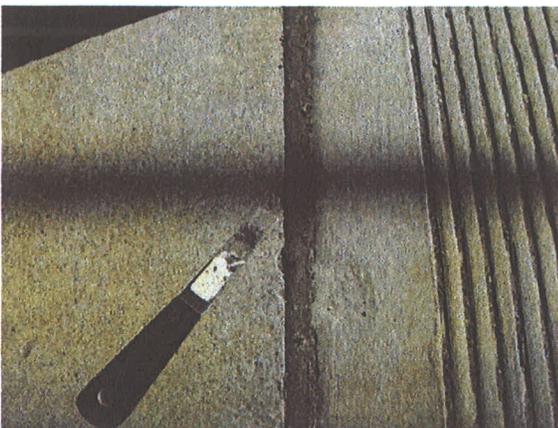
San Francisquito Creek Bridge (Bridge No. 35-0013) brown fiberboard at sidewalk joints
